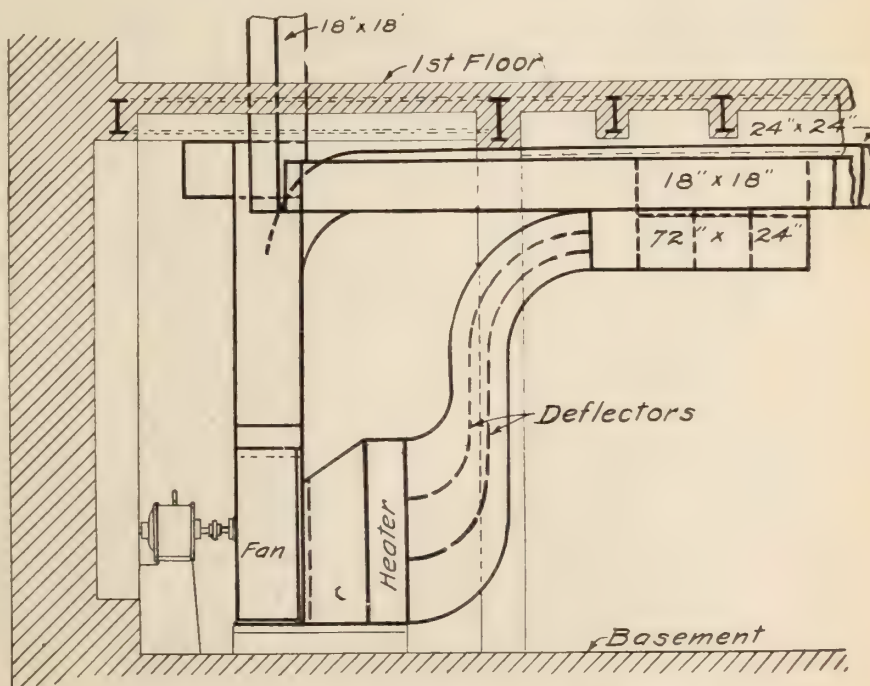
ELEVATION OF BASEMENT FAN ROOM NO. 8.
